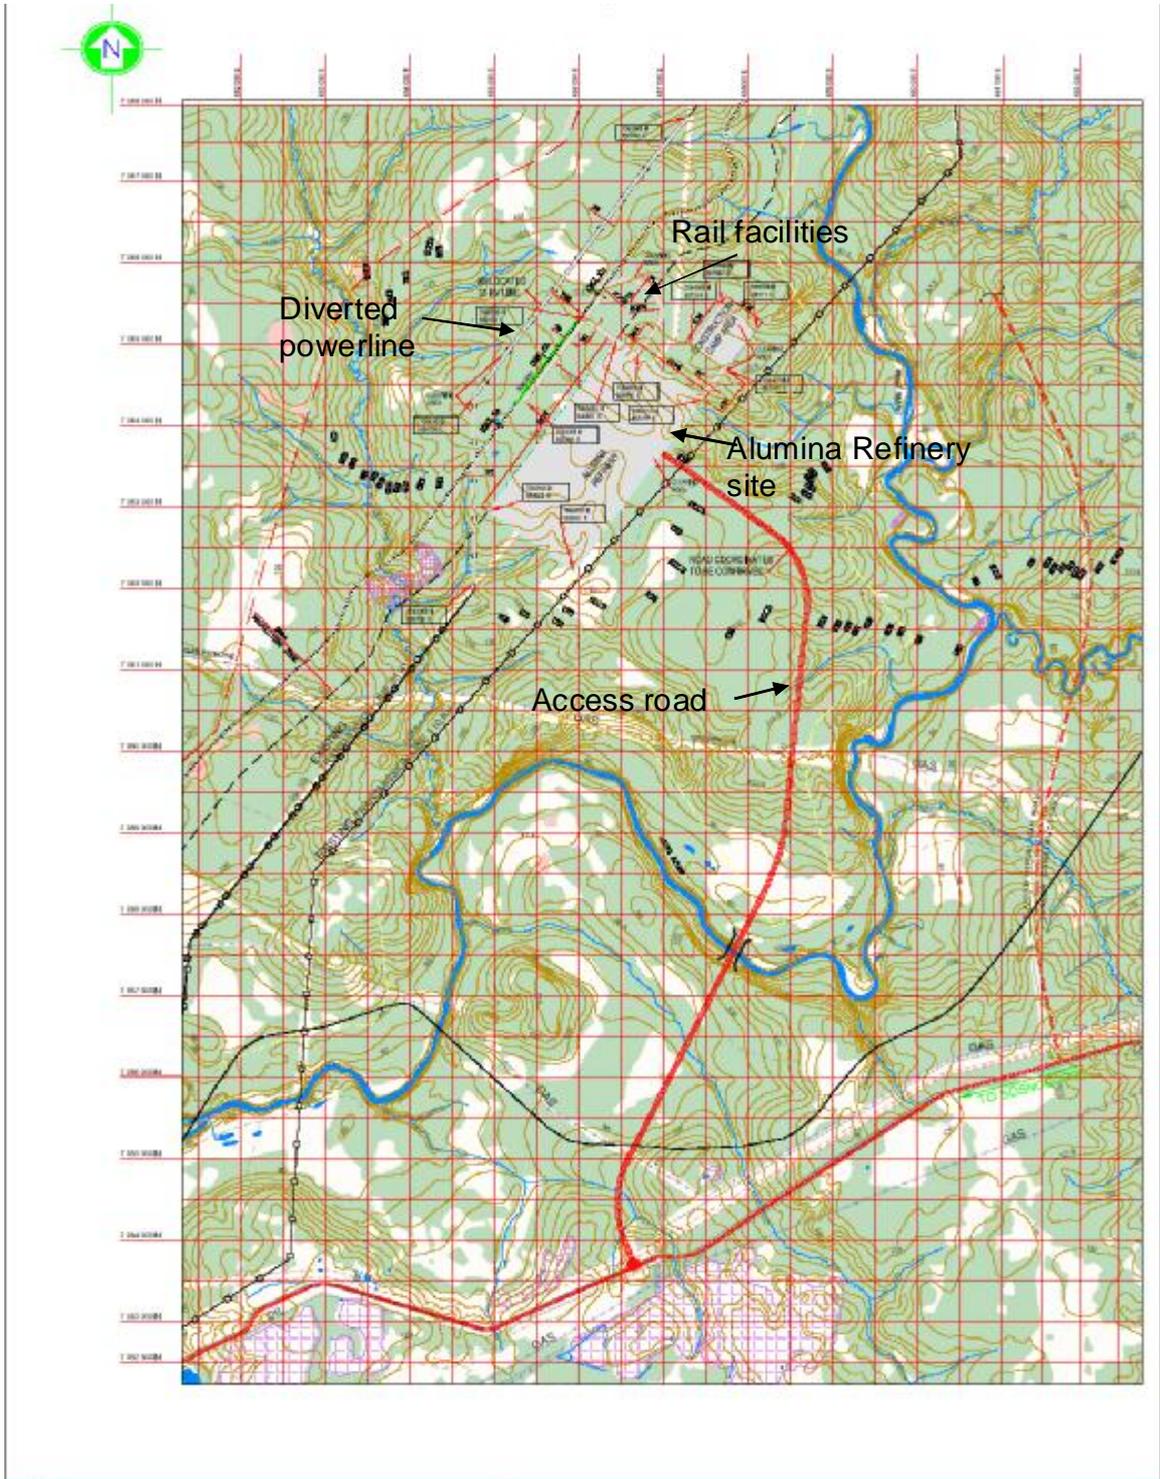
Plan of proposed refinery site “early works” (not to scale)
